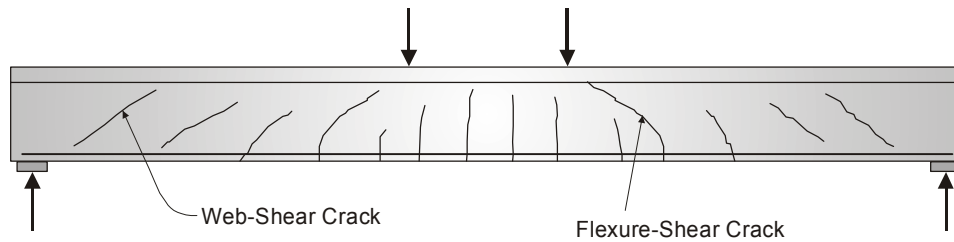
Typical Shear Cracks in Prestressed Concrete Members
